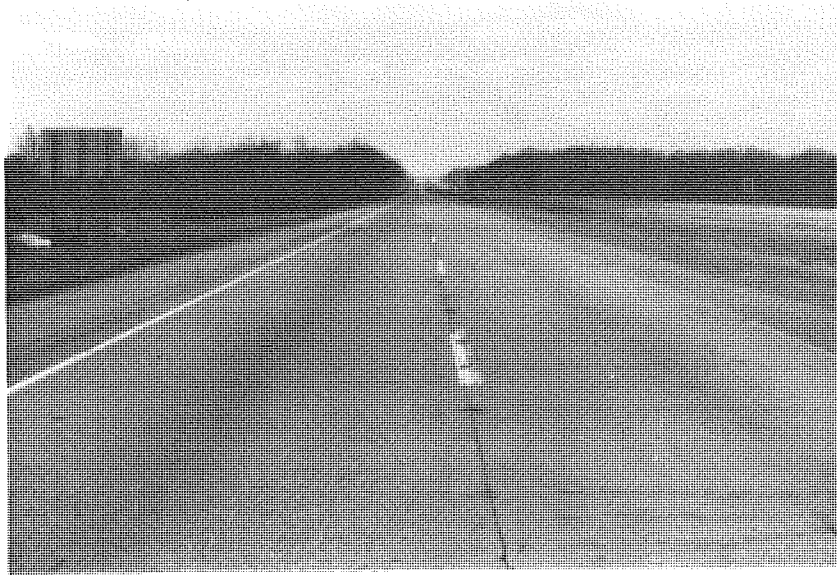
The longitudinal joint in the CRCP test sections exhibited only minor to moderate spalling and patching and only occasional areas where the joint had separated.
